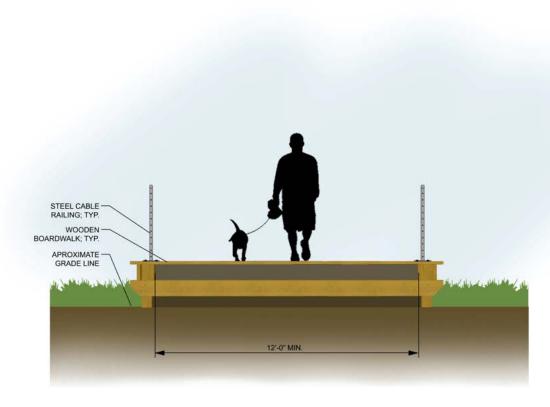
| Typical Wooden Boardwalk Conceptual Cross Section
